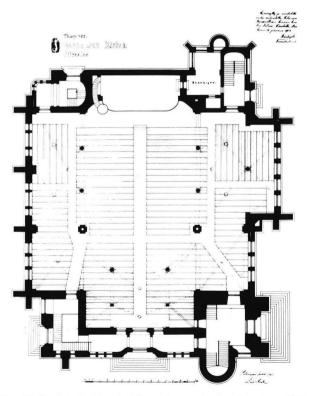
St. John's Church. Floor plan, main drawings from 1901. (Original and photo as in Fig. 45).
